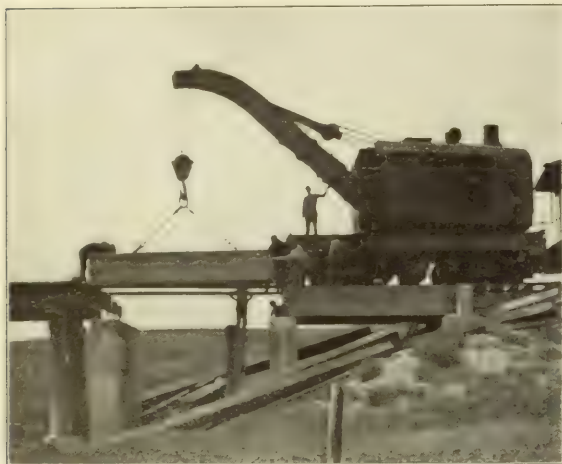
Wrecking Crane Placing a Reinforced Concrete Bridge Slab.
